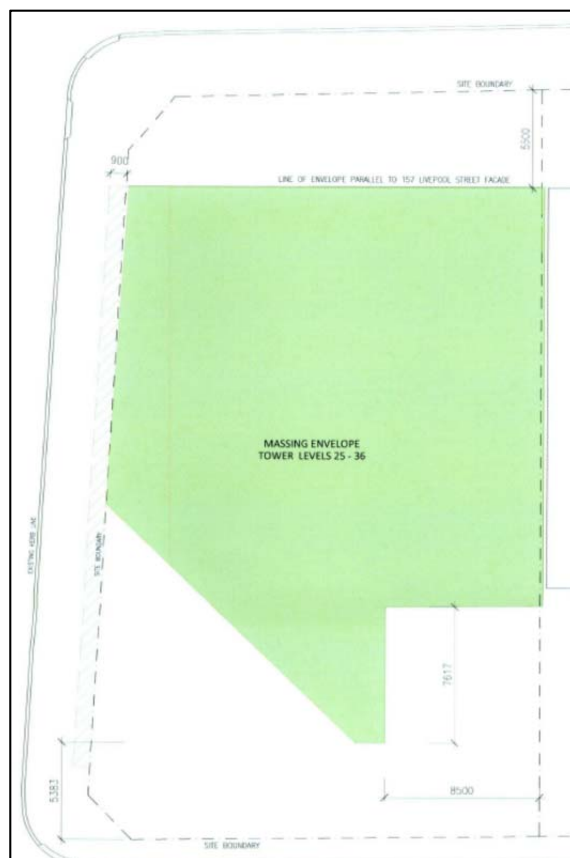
The approved Stage 1 DA tower floor plate, including the chamfered corner
